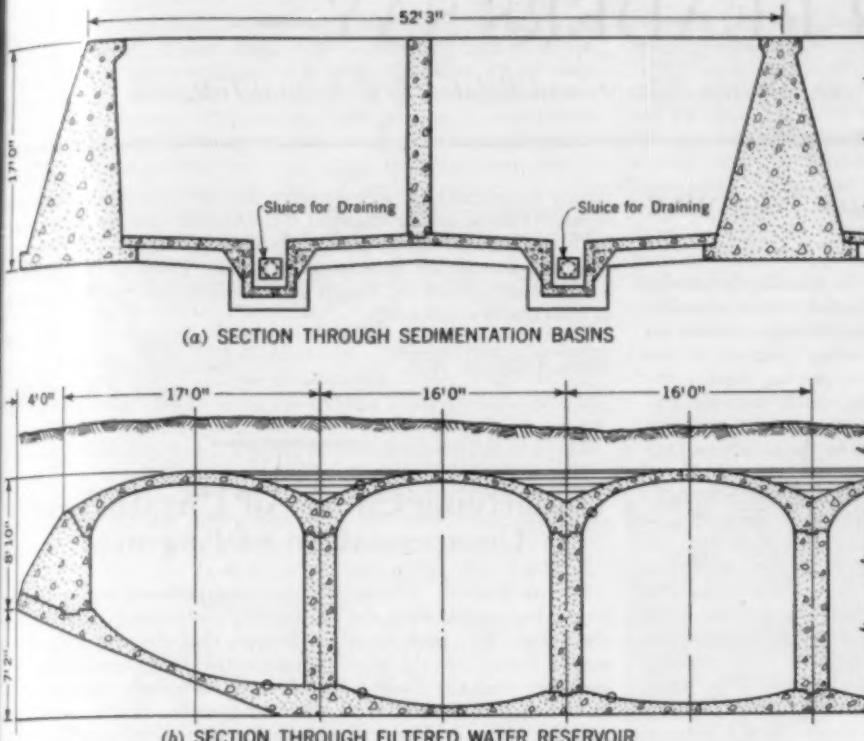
SECTIONS THROUGH ADDITIONS TO PORTSMOUTH WATER WORKS
